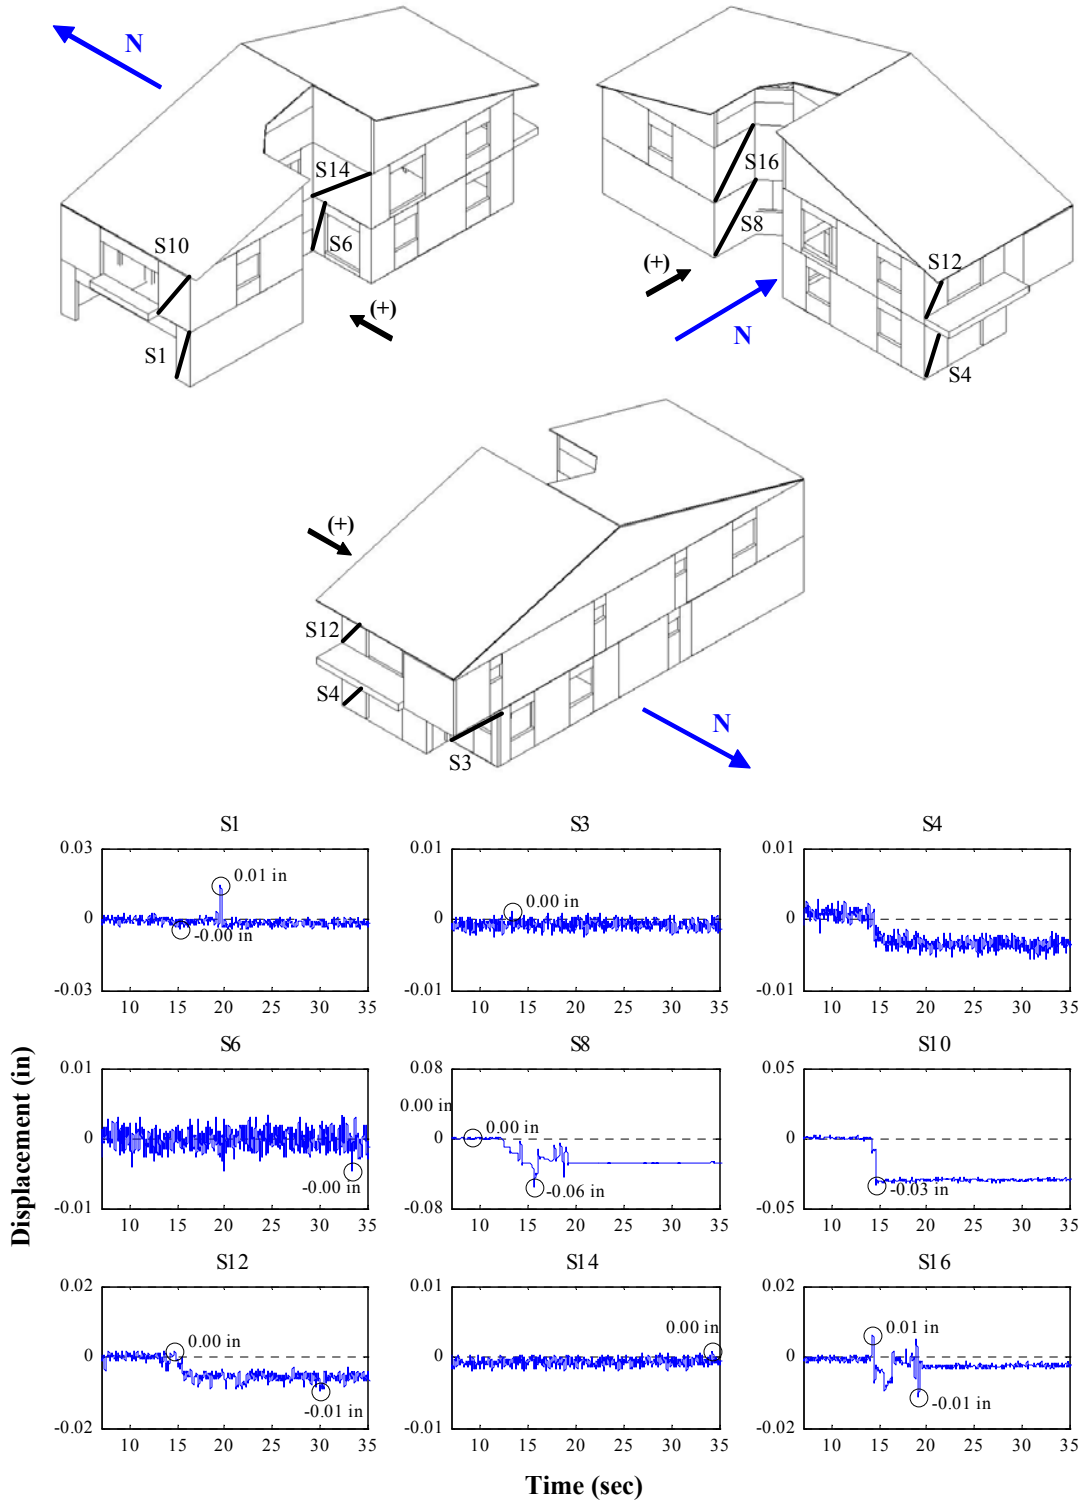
Wall deformations of north-south external walls for Test NWP2S21
